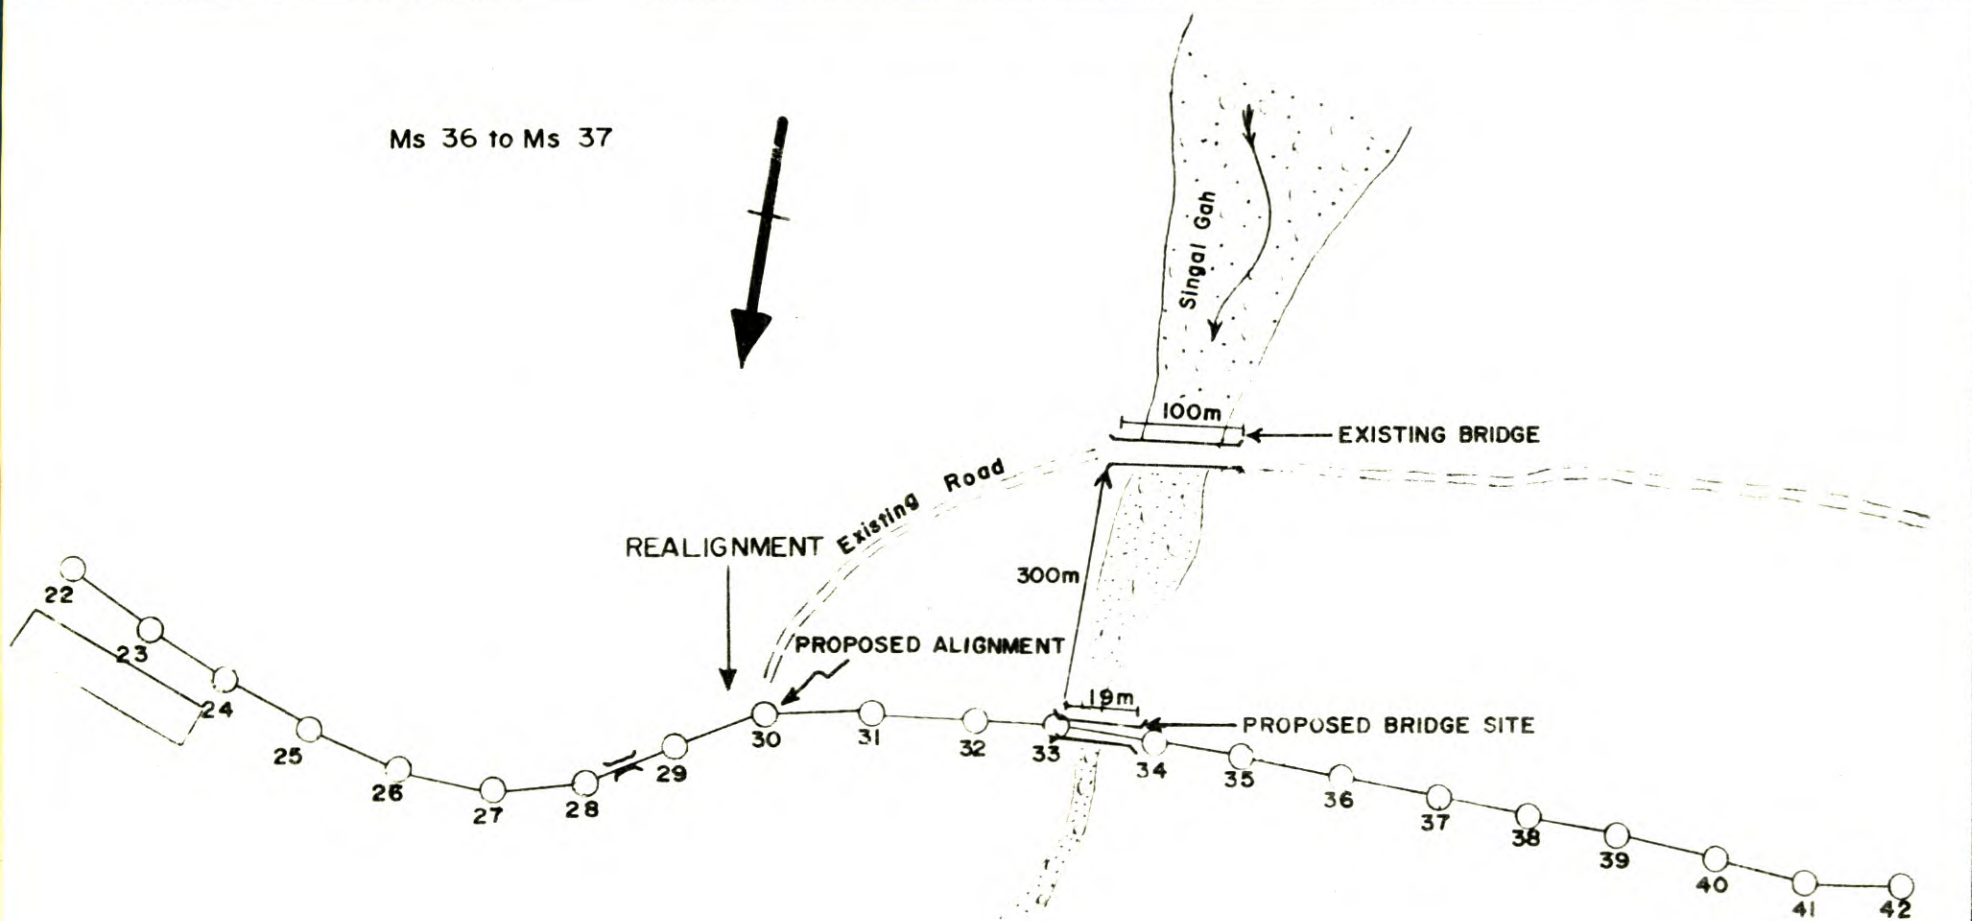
Proposed bridge site and road alignment across the Singal Gah.
